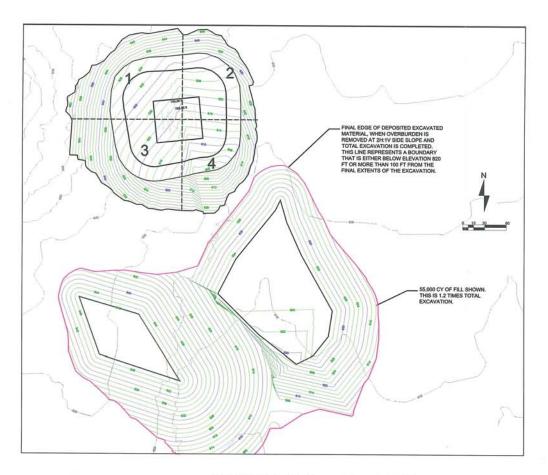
Detail from VTC's drawing M-708 showing the final bathymetry of the excavation site and the deposited fill.
